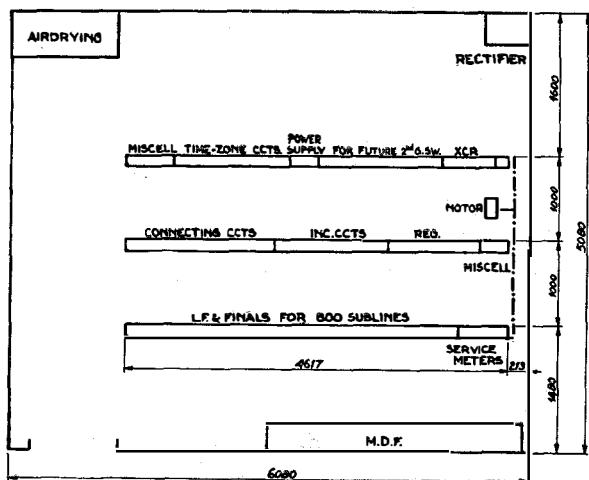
Floor plan of the automatic switch room of the Warmond exchange.
